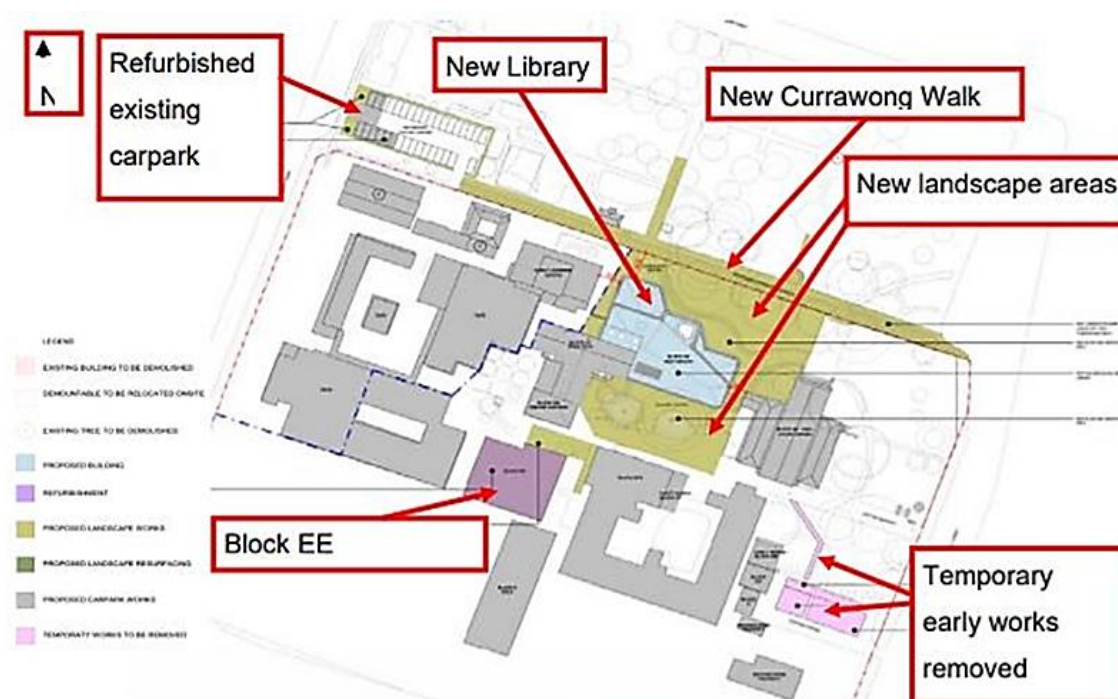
Proposed site layout (Young High School Library and Joint Community Facility EIS, 2019)
